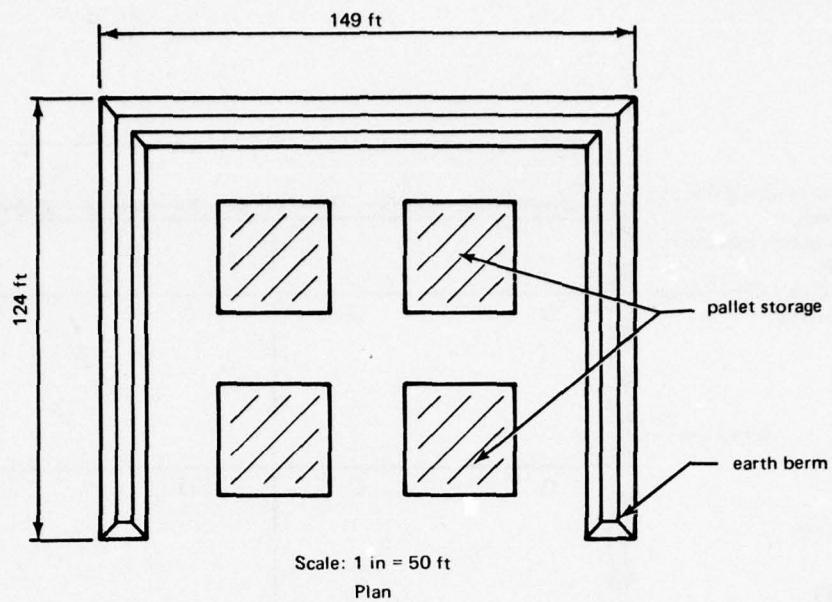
Typical 250-ST, aboveground, noncovered, earth-bermed revetment.
